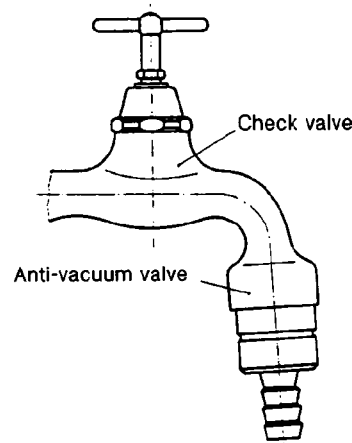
Example of a combined check valve and anti-vacuum valve as specified in DIN 3266 Part 1
